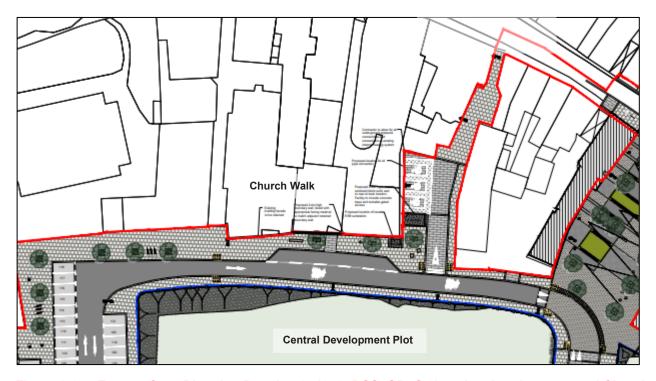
Excerpt from Planning Drawing 231932_DSS_OP_G_100 showing the proposed Church Walk
